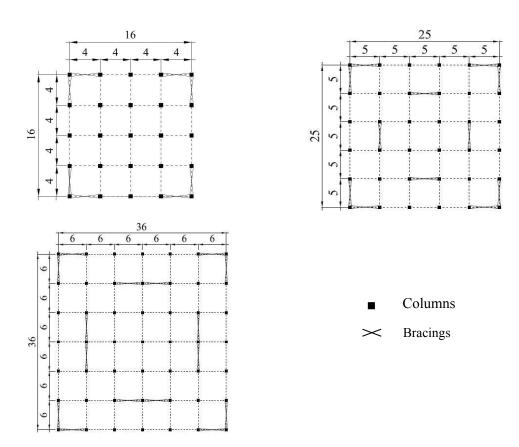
Configuration of the bracings: (a) buildings with four bays in each horizontal direction, (b) buildings with five bays in each horizontal direction, (c) buildings with six bays in each horizontal direction [31].
